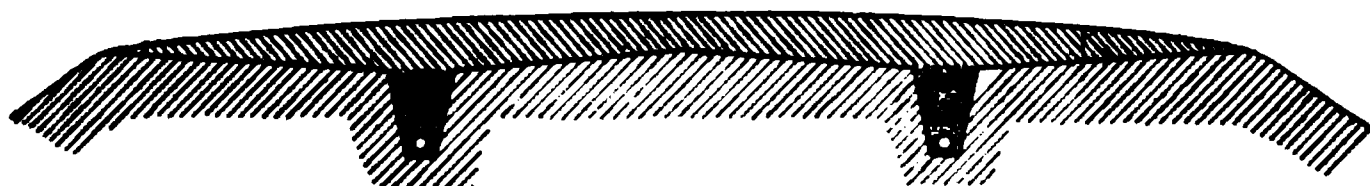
FORM OF SUBGRADE OF A WIDE EQUESTRIAN ROAD.
